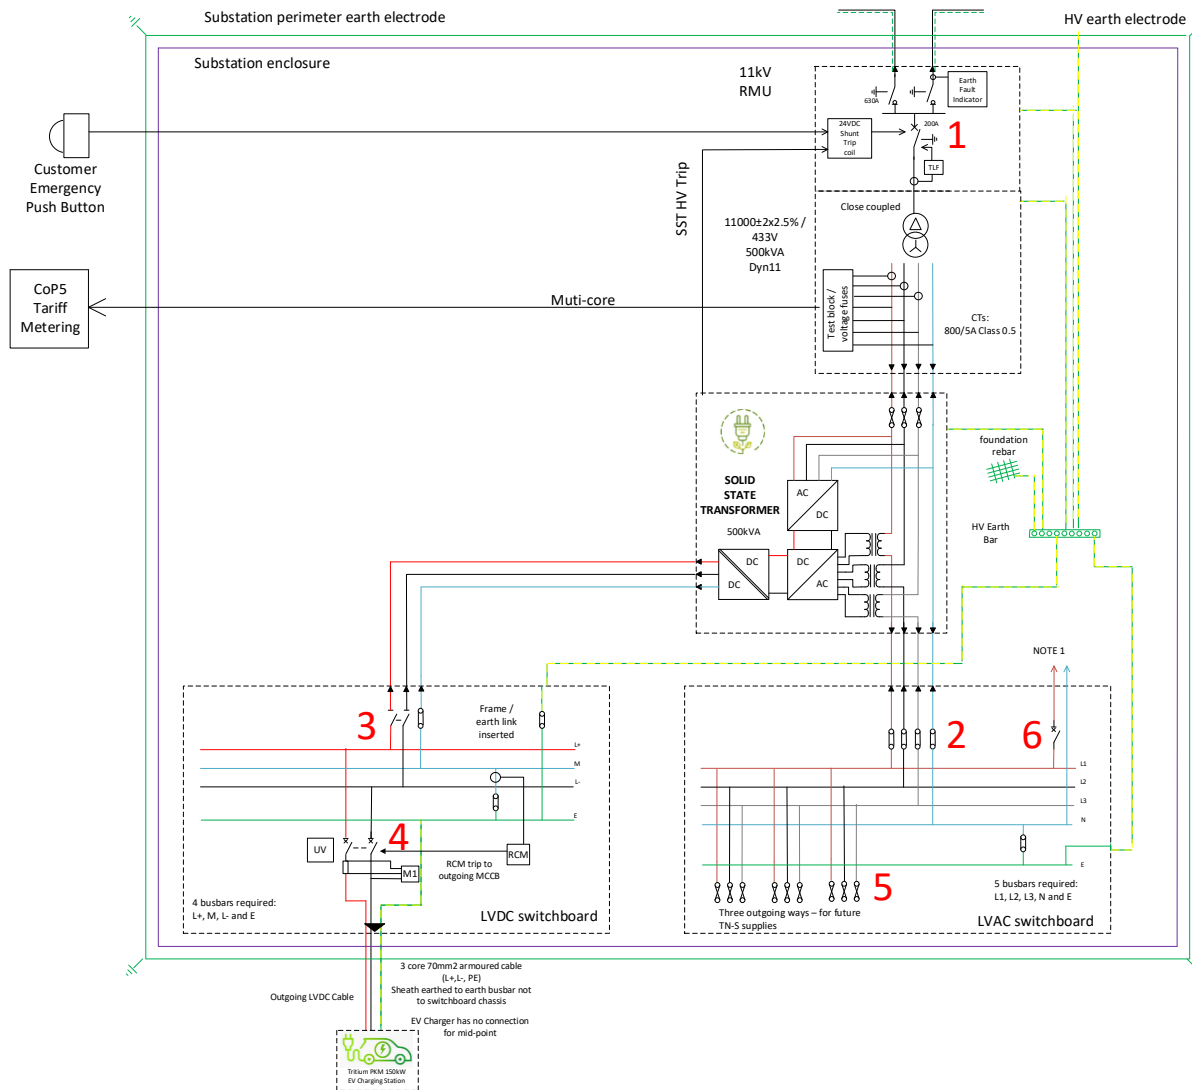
Electric schematic diagram at Falkirk substation – other trial sites use similar electrical arrangement.
